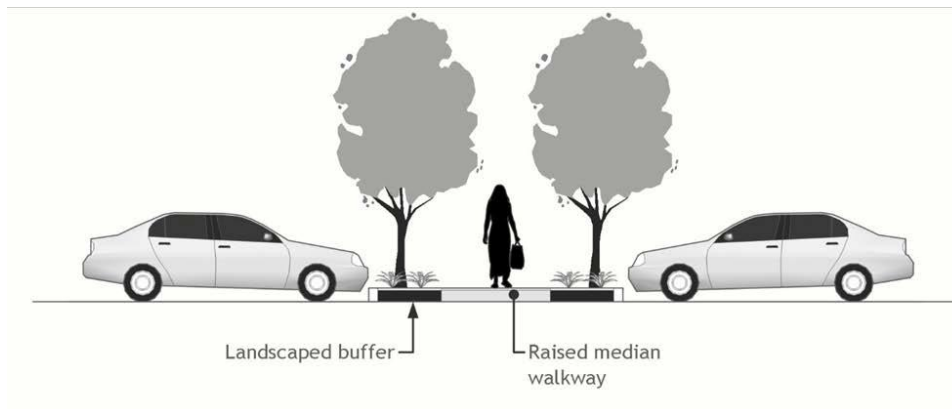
C: Pedestrian Walkways in Parking Lots
